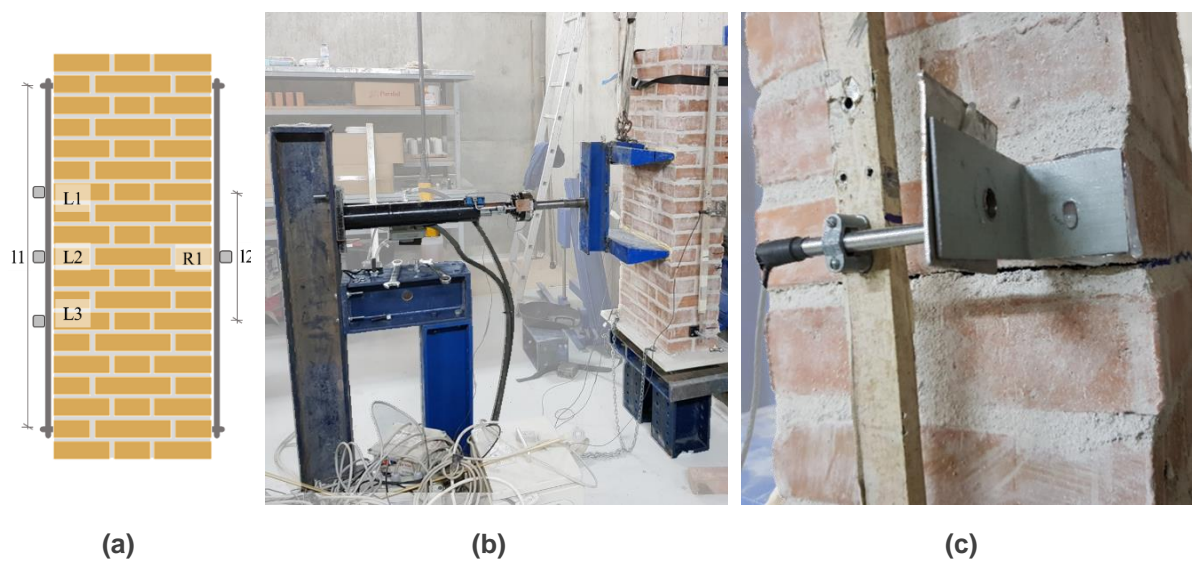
Wallets subjected to flexural test: (a-b) specimen and test set-up; (c) W02 mode of failure.
